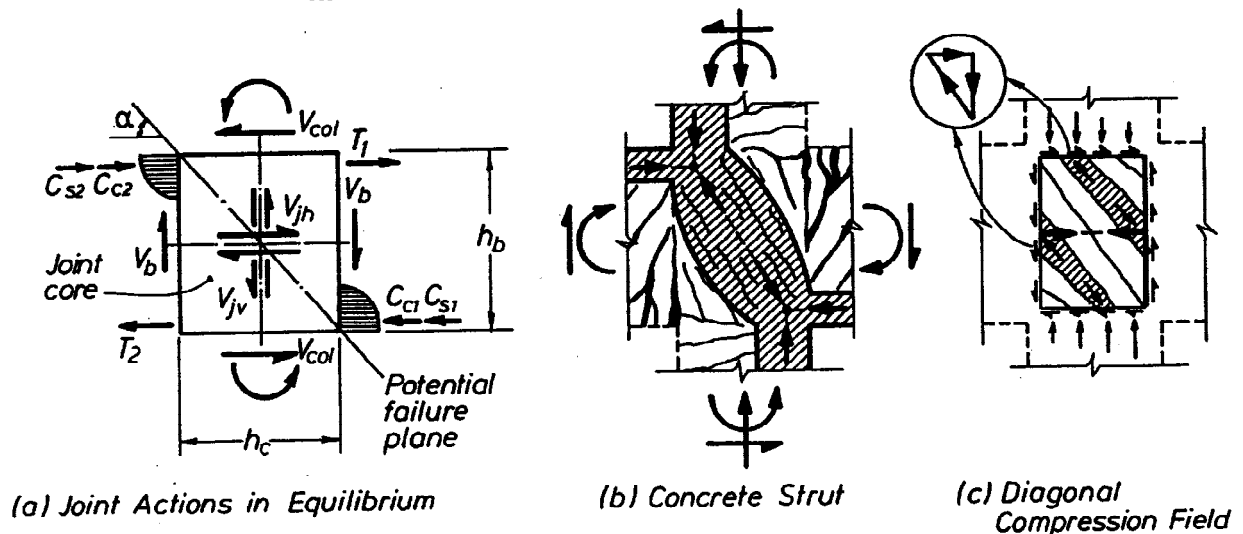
Internal actions in equilibrium at an interior beam-column joint and joint shear resisting mechanisms.
